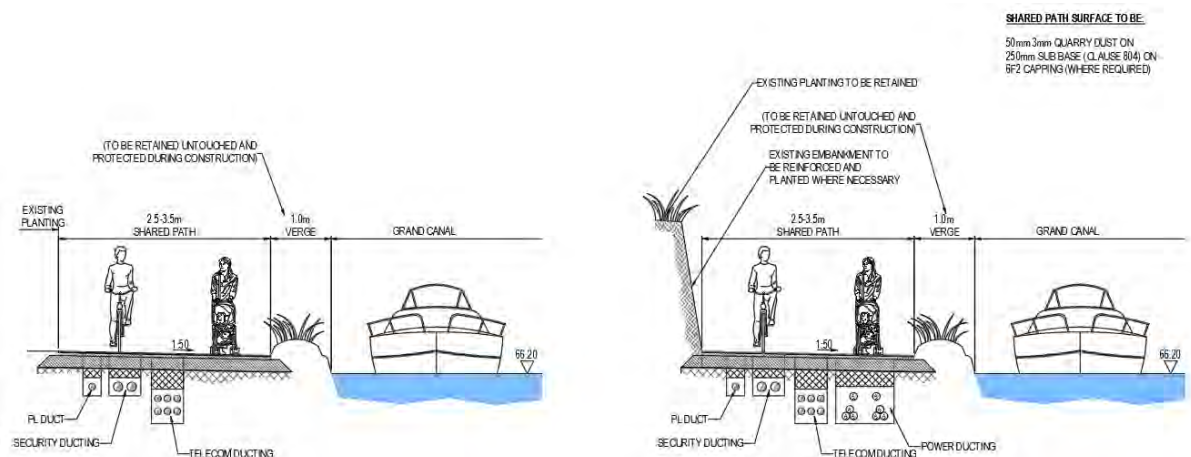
Typical Cross Sections of the Proposed Greenway Scheme
